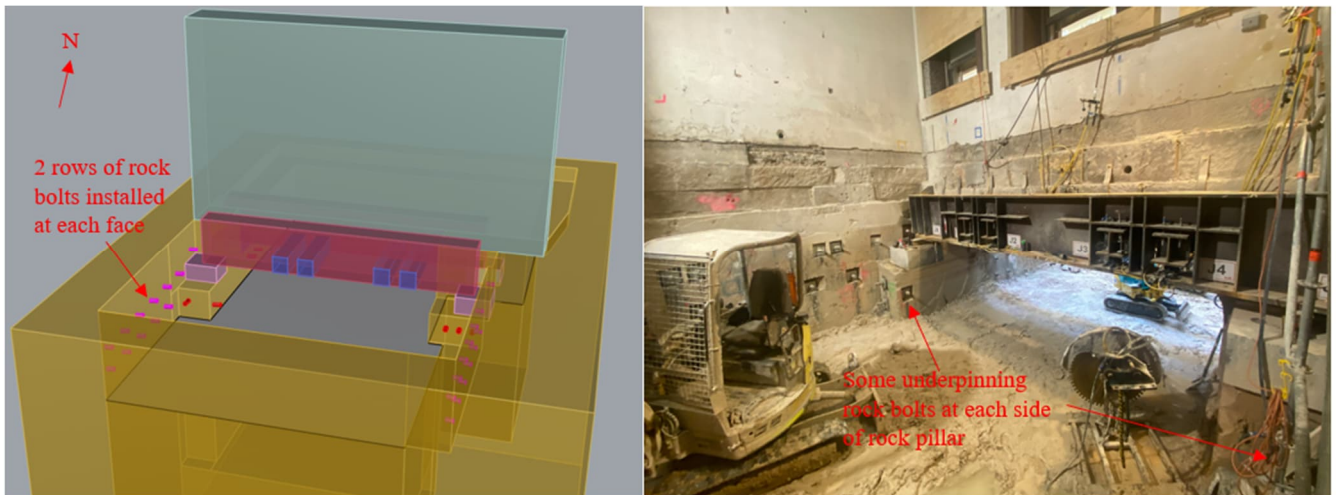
Wall breakthrough – 3D model isometric view (left) and site photography (right)
